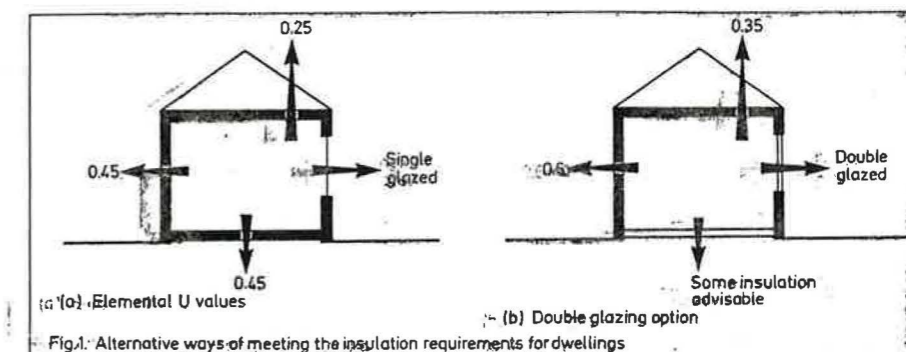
Alternative ways of meeting the insulation requirements for dwellings
